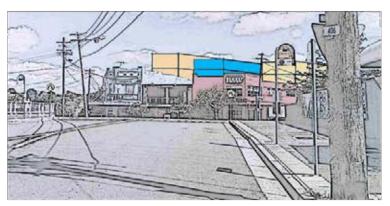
Illustrative example of Crinan Street shapfronts (eastern side) with two-storey additions applying setbacks based on the original main building front roof form shown in Figure 34 below. View is looking north from the Hurlstone Park Station.
